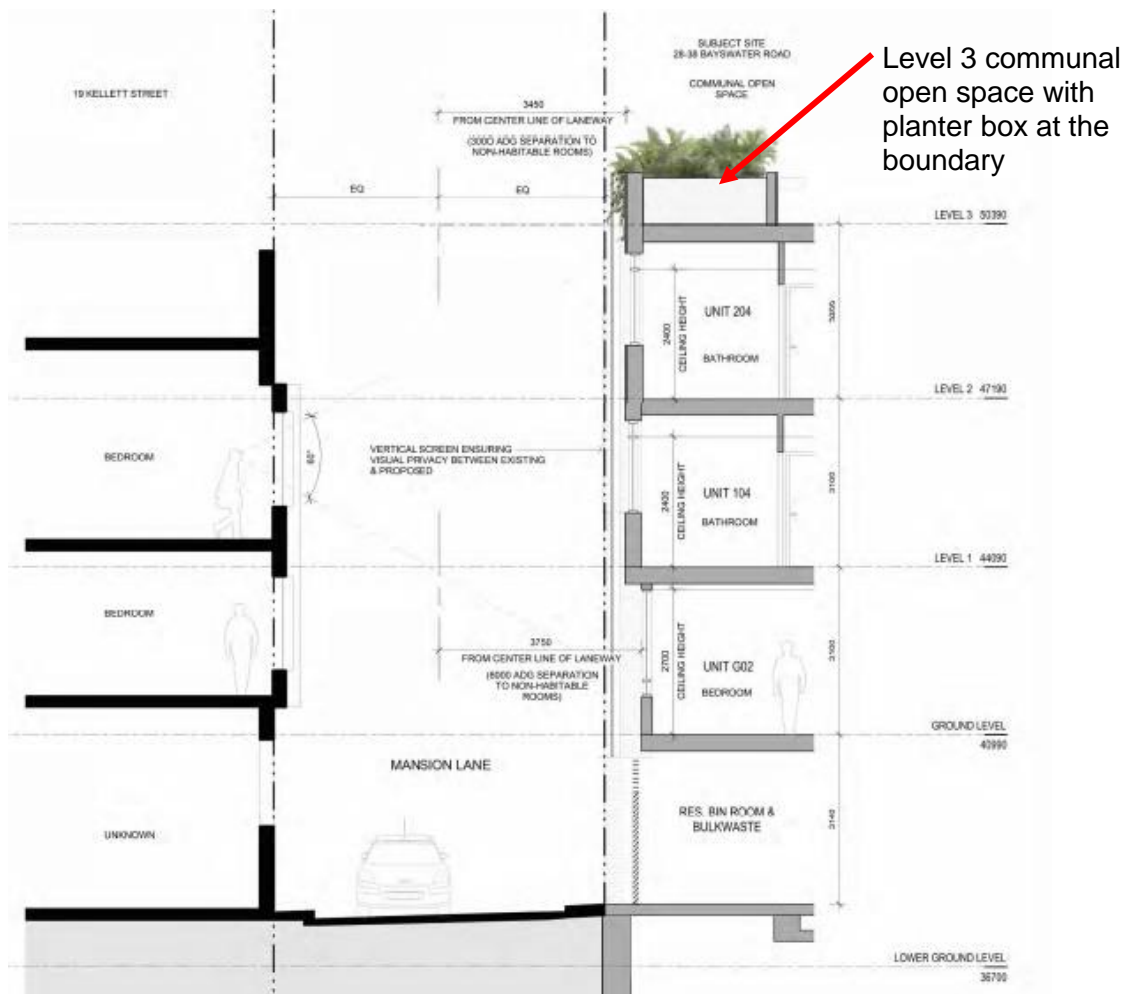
Section plan showing relationship between the proposed communal open space and the existing development on the northern side of Mansion Lane
